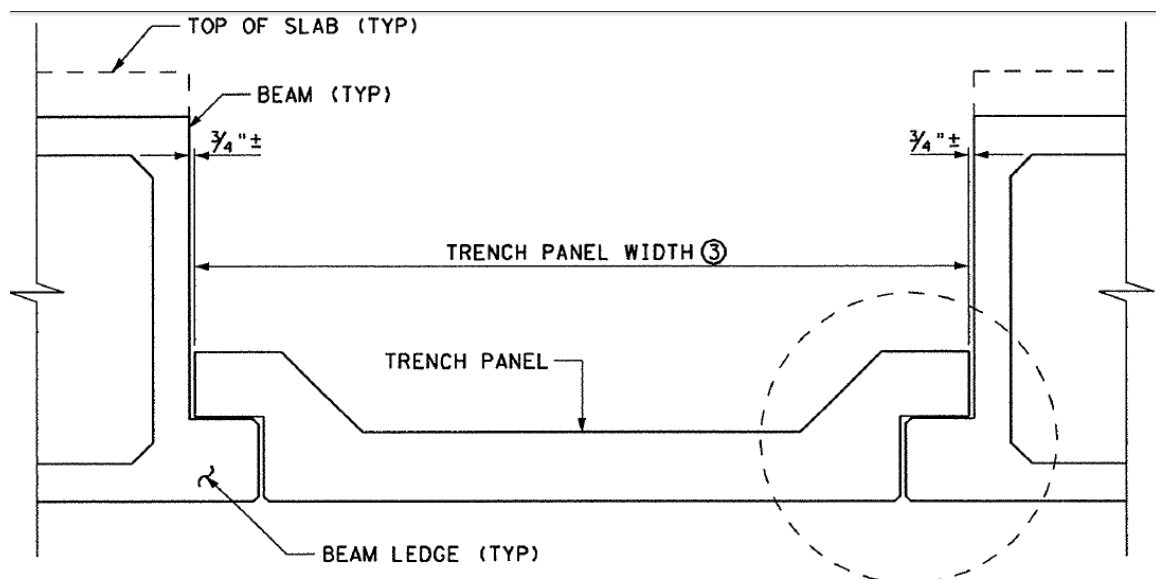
Section View of Deck That Will Support Park (construction plans)
